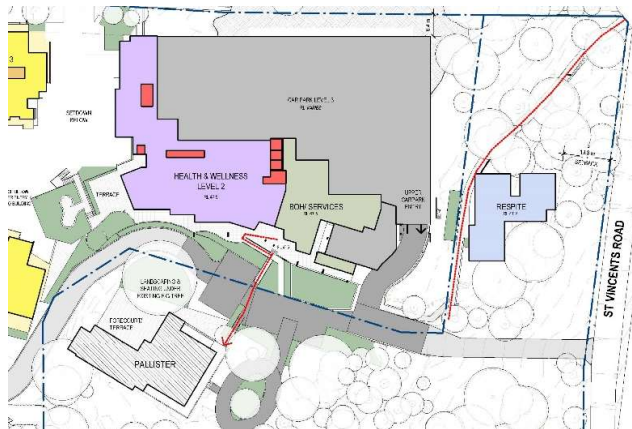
Location of the existing path linking the corner of River Road and St Vincents Road shown in red. (Source: Bickerton Masters Dwg: 1213 IN.12 P6)
